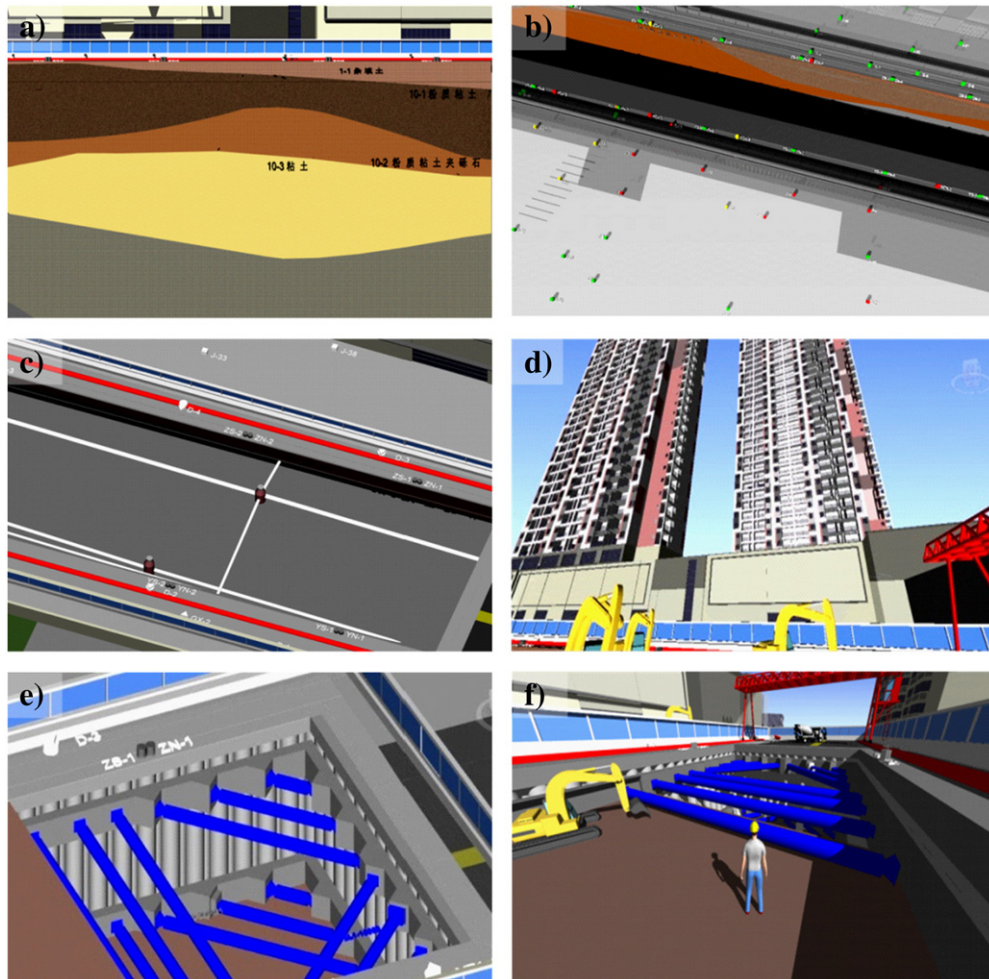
3D models of key elements in metro construction: a) geotechnical model, b) monitoring items, c) underground pipelines, d) neighboring buildings, e) structural elements, and f) equipment and worker.
